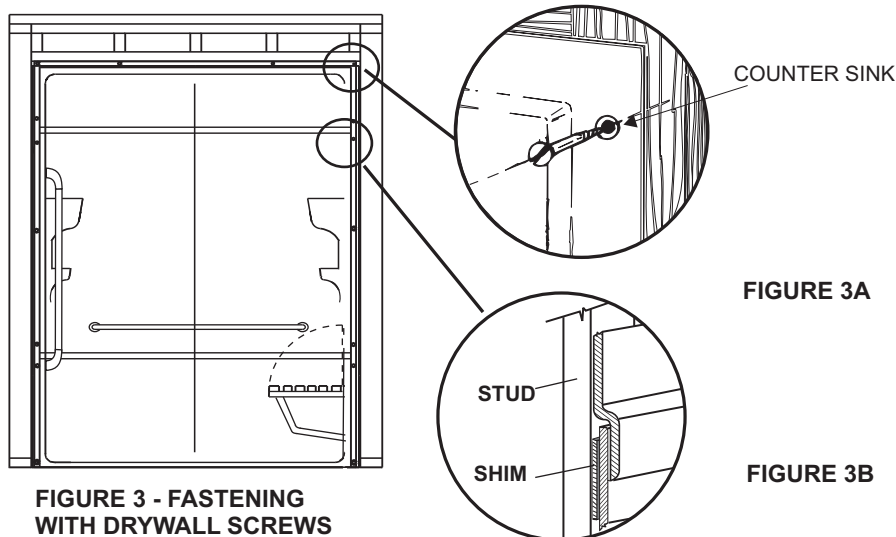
FASTENING WITH DRYWALL SCREWS
